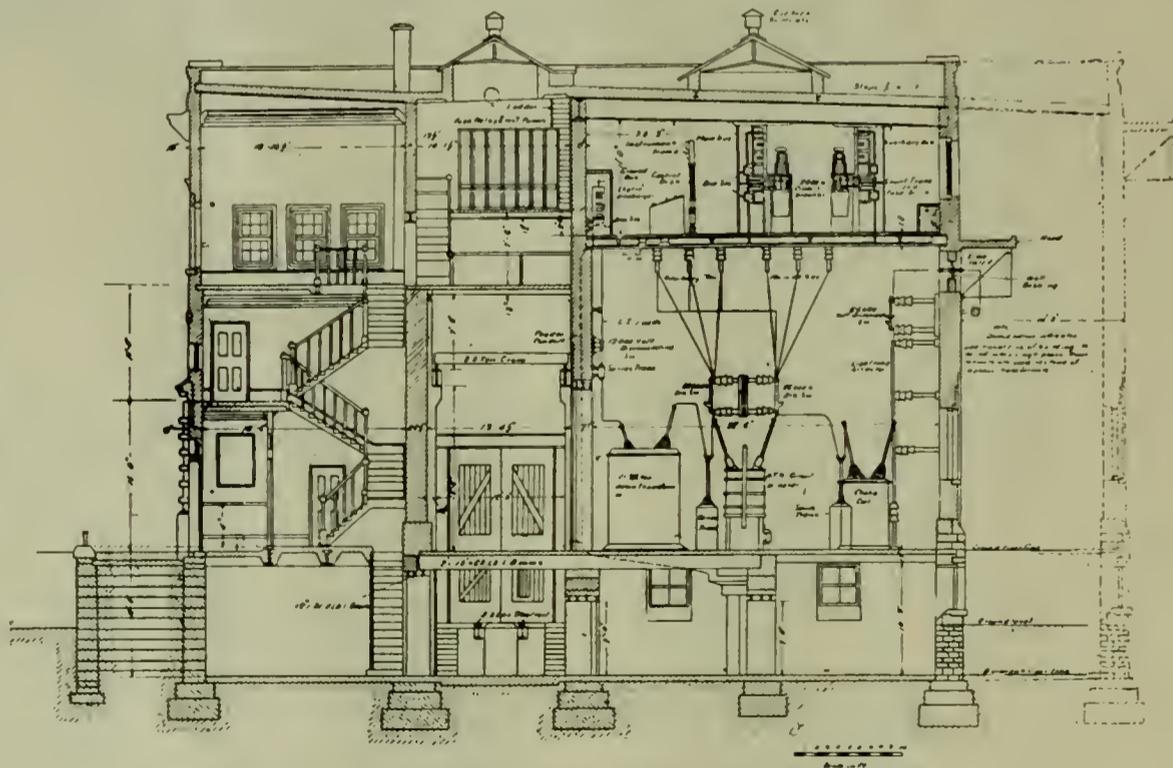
66,000-VOLT TRANSFORMER STATION, SECTION.
